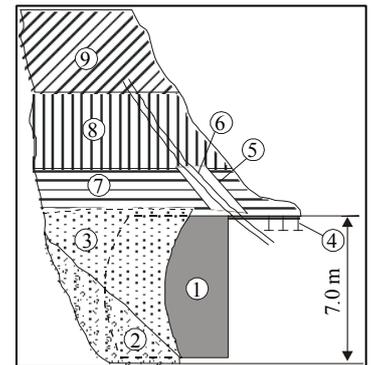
Filling of a cavern from inside the tunnel (Milanović, 2000). 1. TBM; 2. Cave clayey deposits; 3. Inert material – sand; 4. Tunnel support; 5. Shaft; 6. Pipe connected with concrete pump; 7, 8, 9. Stages of concreting.
